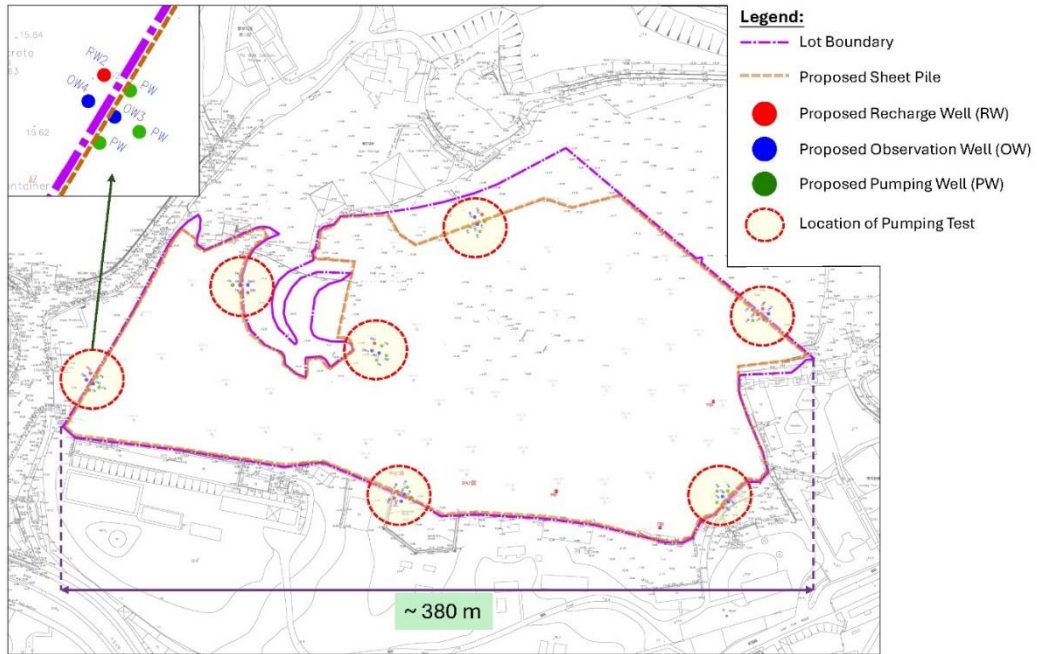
Layout Plan of Partial Pumping Tests at Construction Site in Tuen Mun Town
